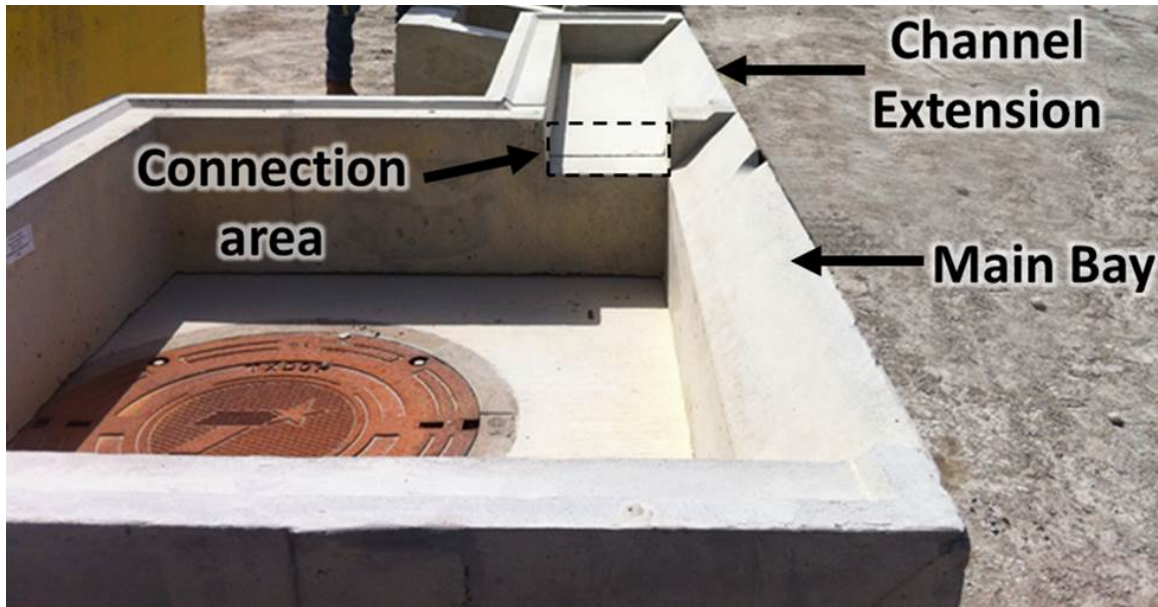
Upper inlet basin of TxDOT PCO 10-ft inlet. Manhole and concrete floor are of separate component on which the upper inlet is stacked (photograph courtesy of TxDOT).
